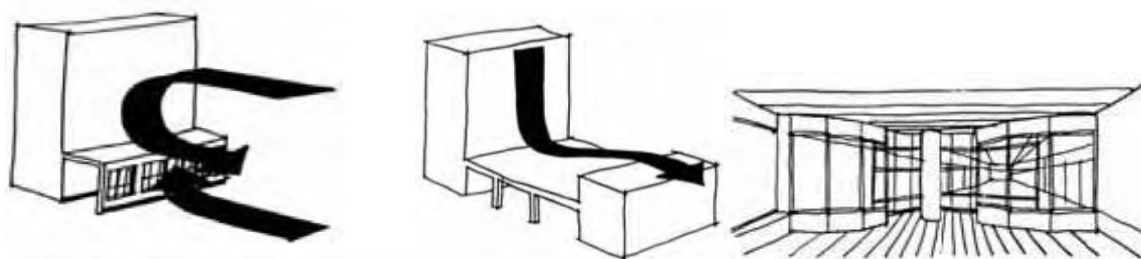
Enclosed Walkways, Roofing over the open spaces, Pedestrian Corridors and Foyers
